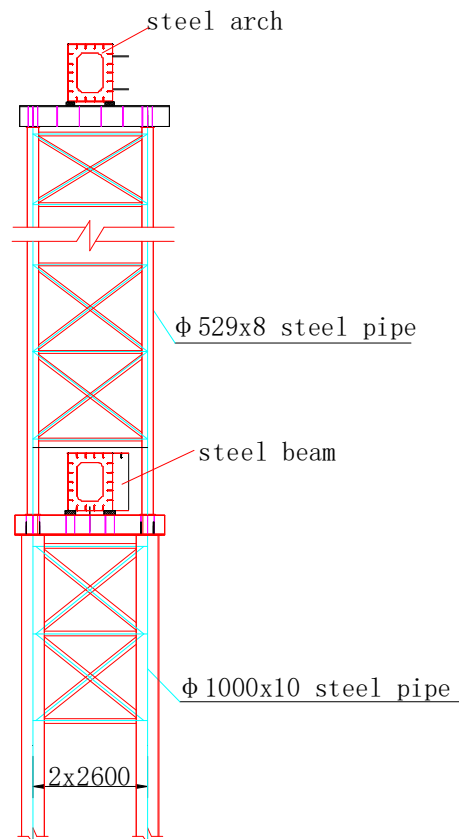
Schematic Diagram of the Cross-Section of the Steel Pipe Column
